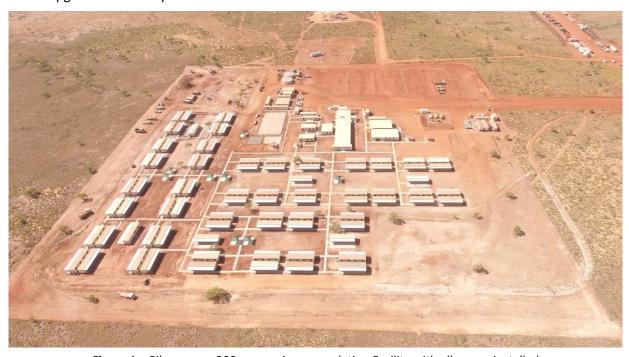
Pilgangoora 300 person Accommodation Facility with all rooms installed
